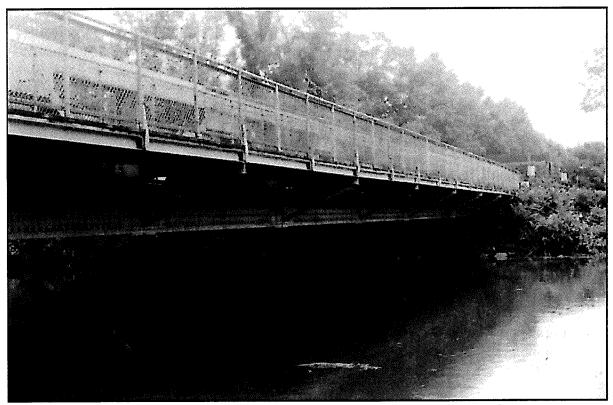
Photo taken of Facility No. 1590 in 2004 looking northeast (JMA 2006).
